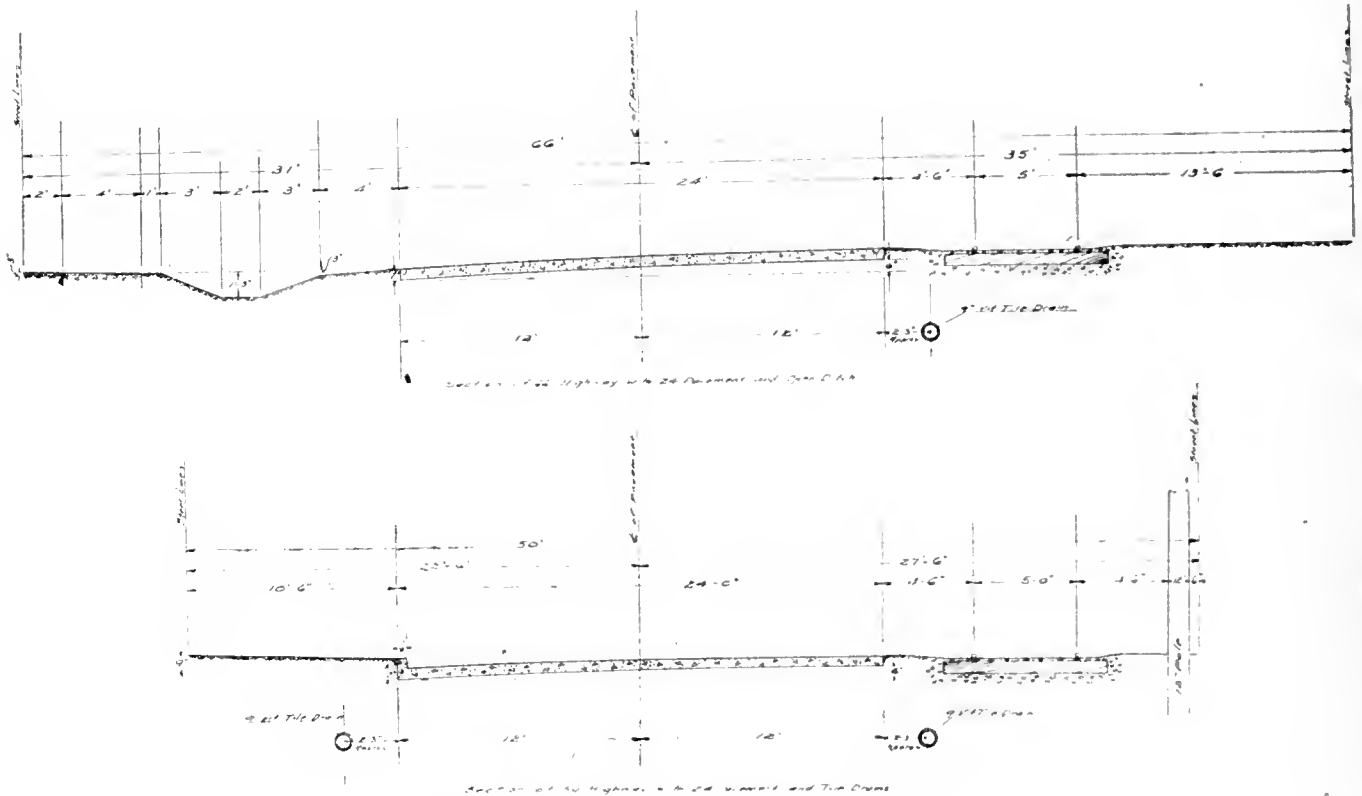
(upper)—Cross-section of 24 ft. pavement with open ditch.
